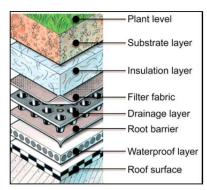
Layers of a Typical Modern Vegetated Roof (Gartner, 2008)
